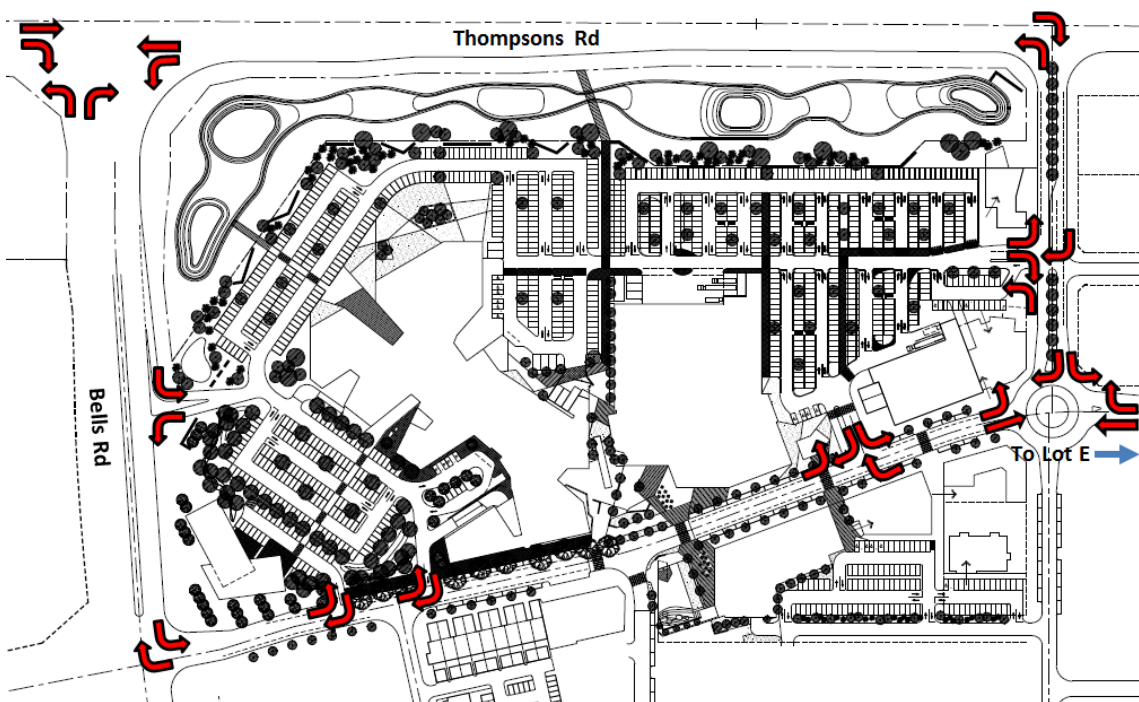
and Figure 1.2 has been prepared to outline the interim access arrangement to service the initial stages of the development.
